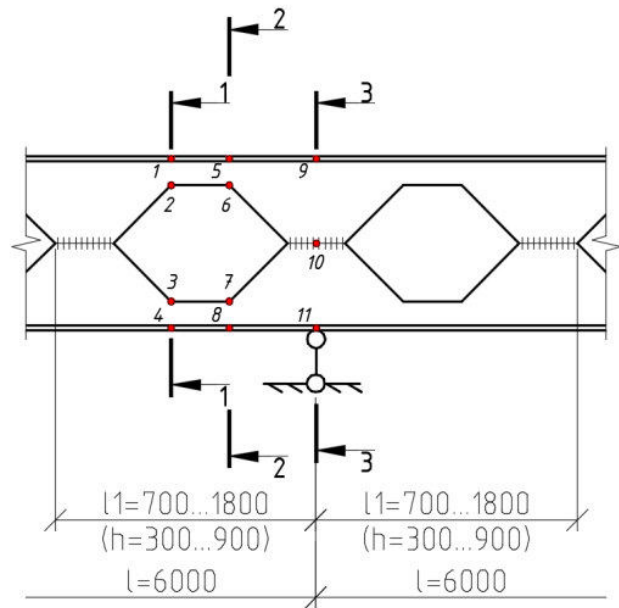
Support section without stiffeners and with unwelded holes (type 1)
